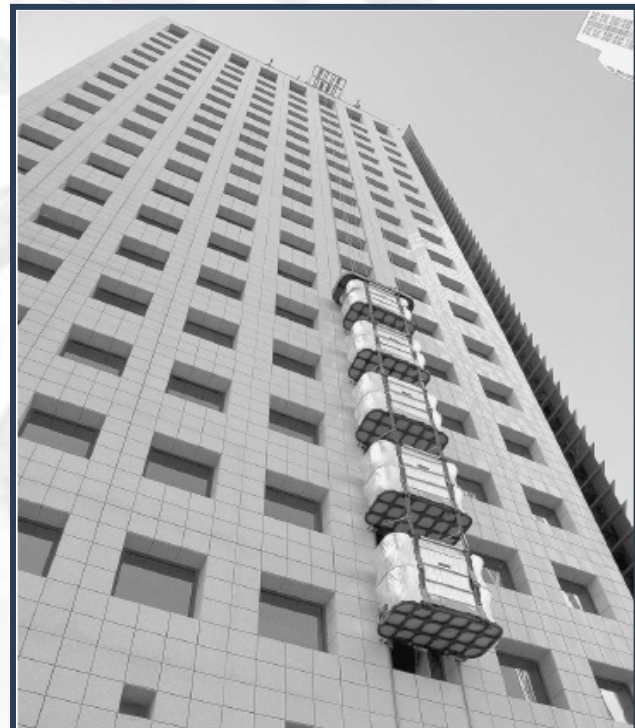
Roof-supported platform rescue system with multiple platforms as installed on high-rise building. (Photo courtesy of Escape Rescue Systems, Ltd.)
